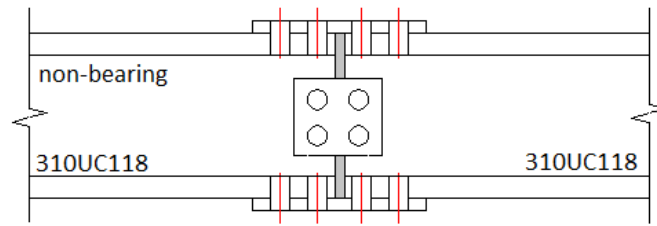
Schematic view of Specimen #4, (Non-bearing with 10mm gap, no fillers, 12mm flange plates)
